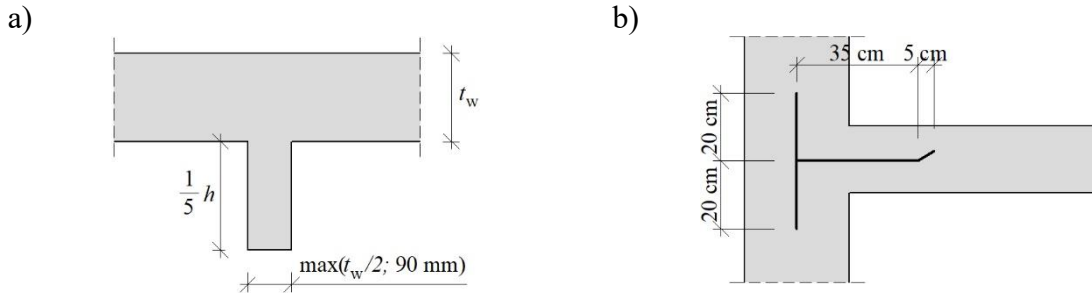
Requirements in Indian standard [N10]: a) minimum dimension for masonry wall or buttress providing effective lateral supports, b) anchoring of stiffening wall with the transverse wall:  $h$  – the height of the wall
